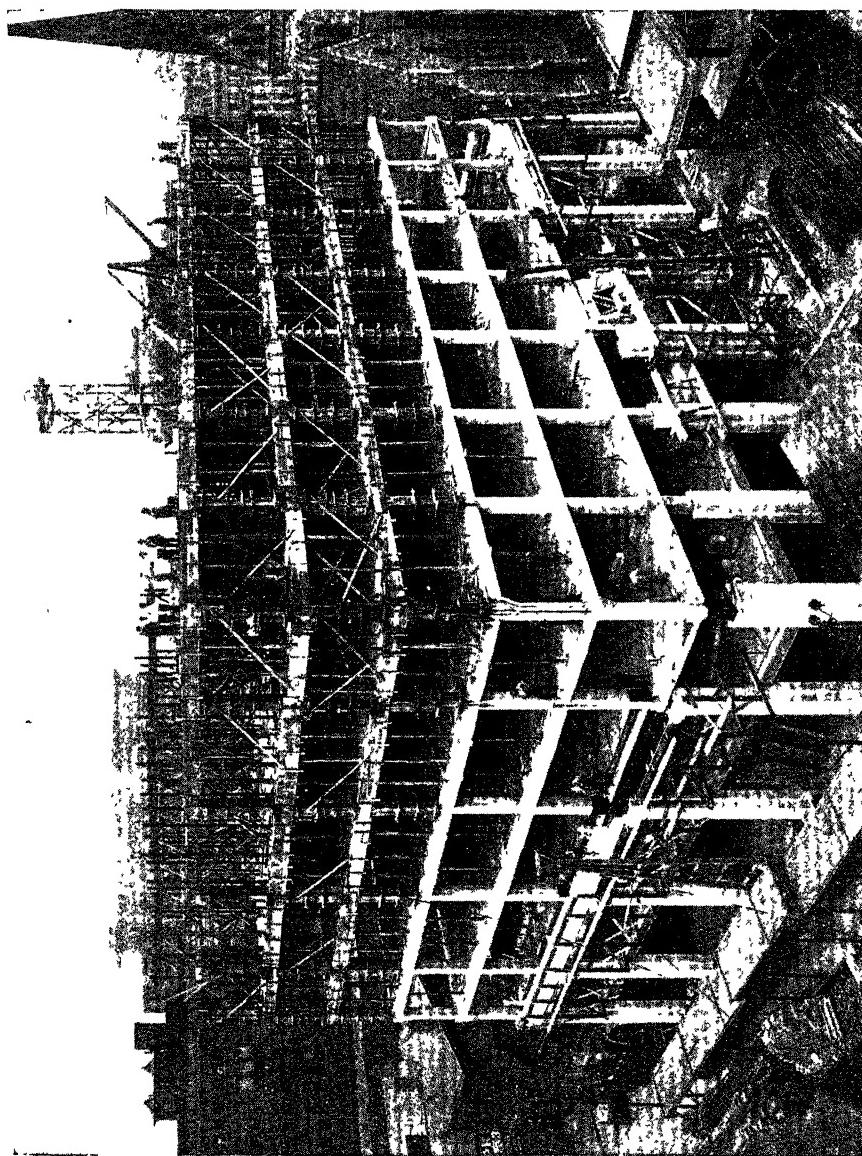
View of Reinforced-Concrete Office Building, Showing Floors in Various Stages of Construction
